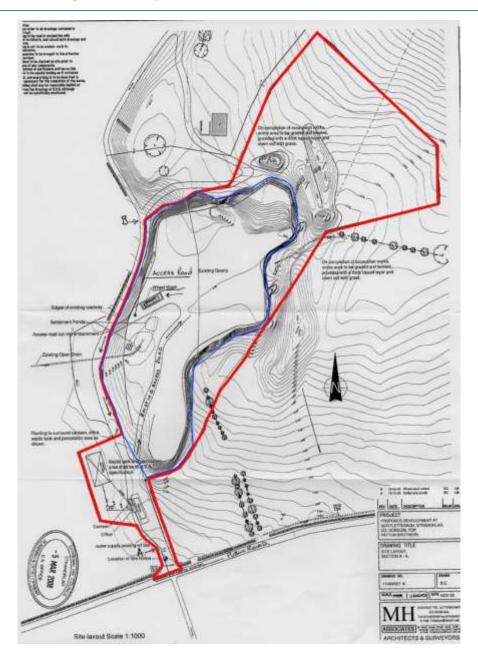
Site Layout Map of 05/60249 (total site area 2.6134ha)
